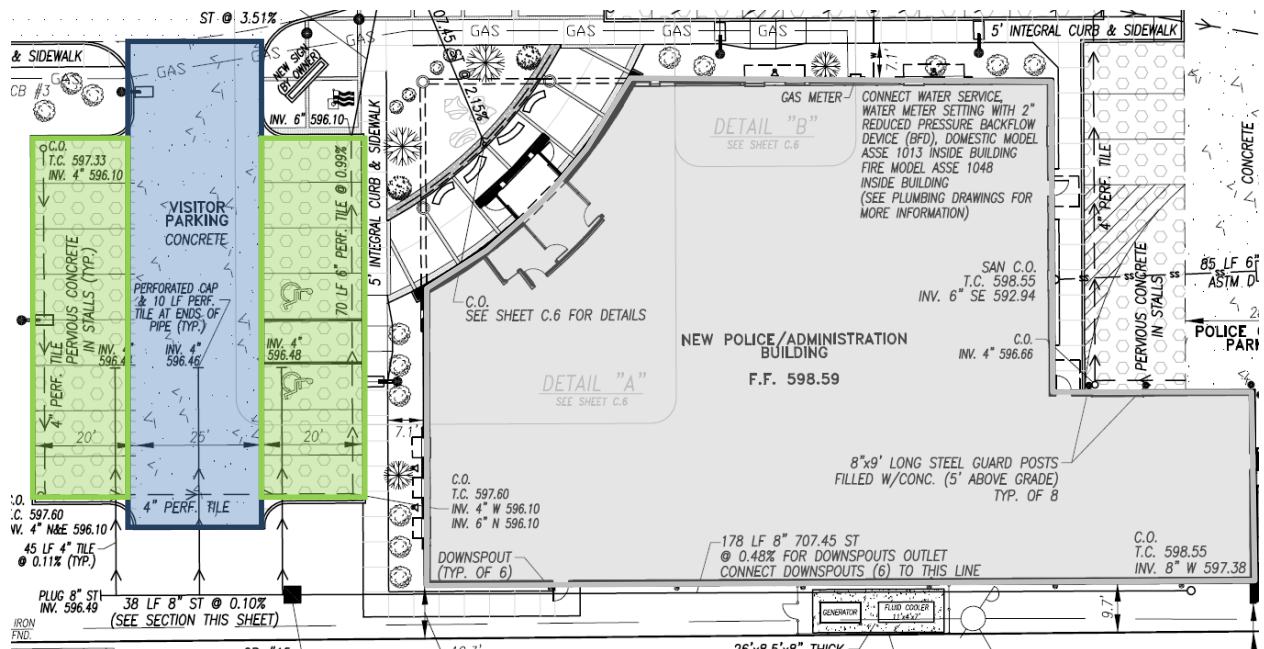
Schematic of Perkins Township site. The pervious concrete is hatched in green, the impermeable concrete in blue, and the building in grey. The single underdrain is shown as a dashed line.
